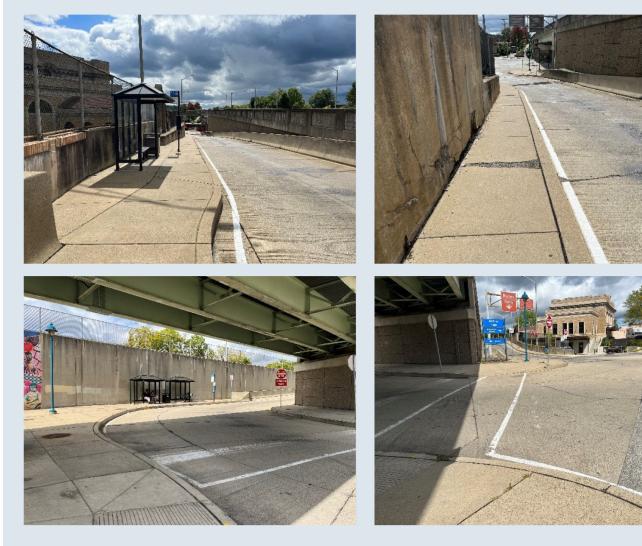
Segment of Pitt Street between Wallace Avenue and Penn Avenue
